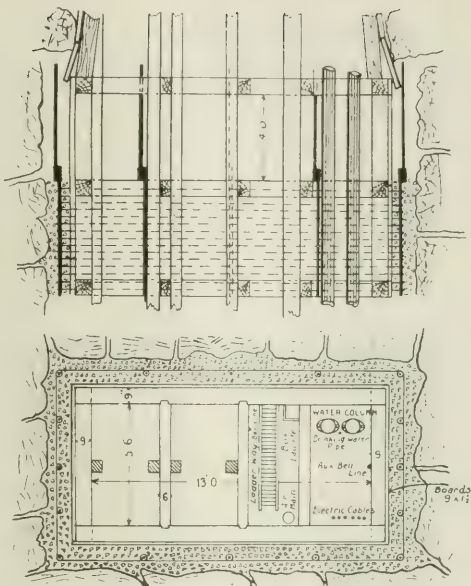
TAYLOR'S SHAFT WITH CONCRETE REINFORCING THE TIMBERS.
